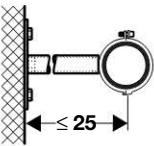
The anchor points are designed at up to 25 cm from the ceiling or wall with pipe bracket fastening 1/2" and the base plate (DN 150 = 3/4")
